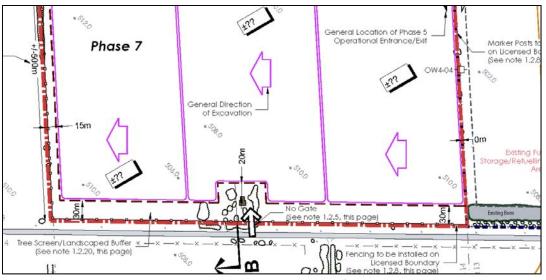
Operational Plan excerpt showing proposed setback from house.
